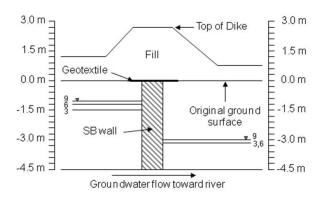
Cross-section of flood control dike and cutoff wall, along with measured groundwater levels at t = 3, 6, and 9 months after wall construction (redrawn after Ruffing 2009).
